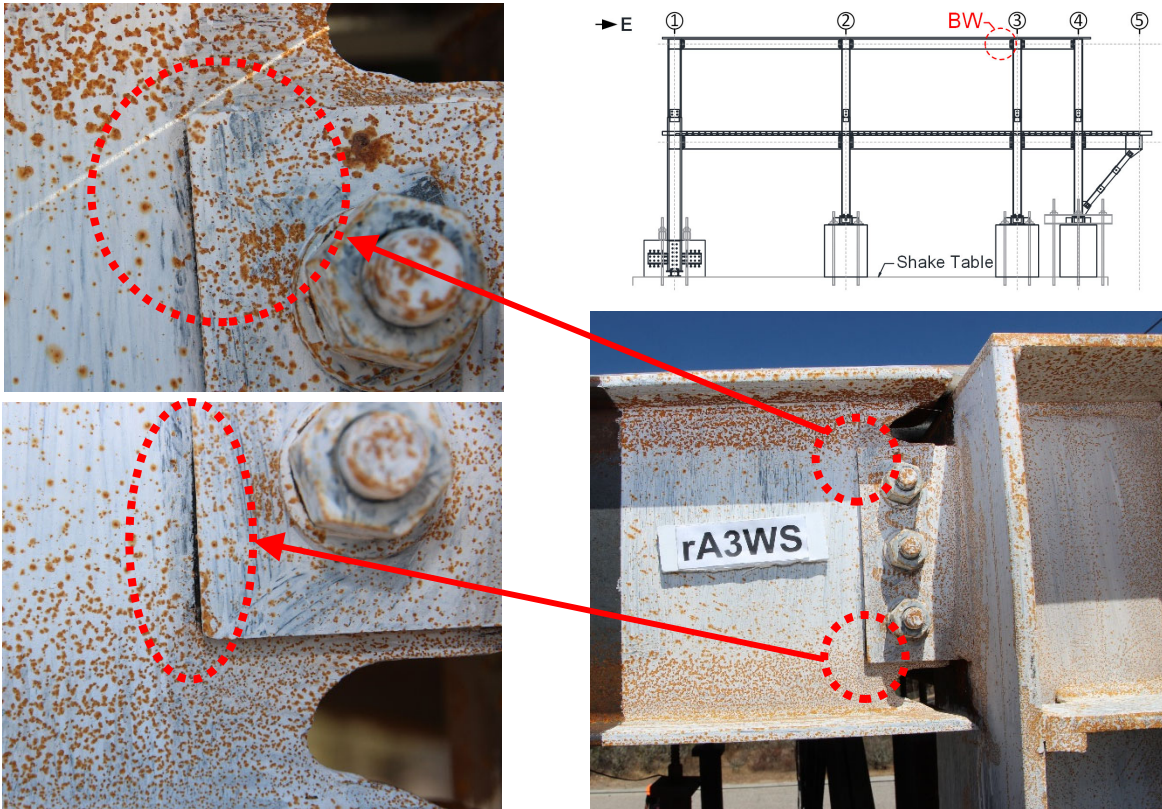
After Test 2B-5: Bolt Slippage at Roof West-Side BW Connections
